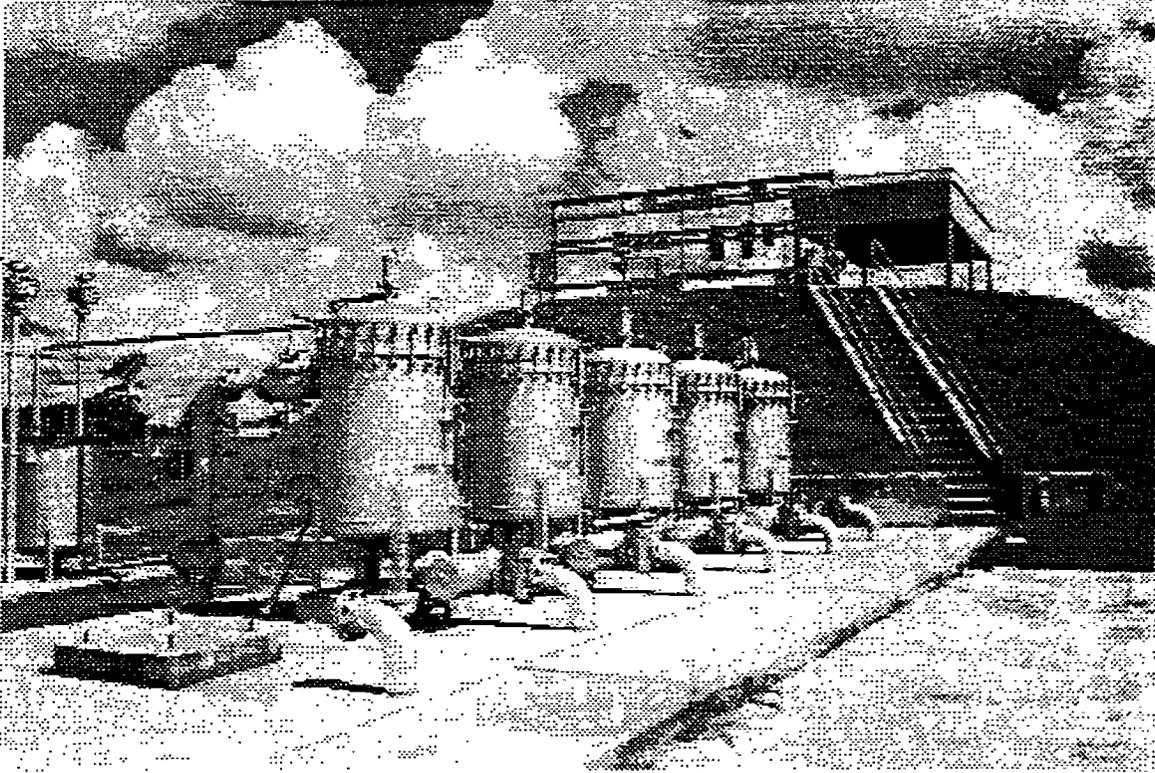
Day tank filters. Filters, concrete slab and piping were removed and recycled.
